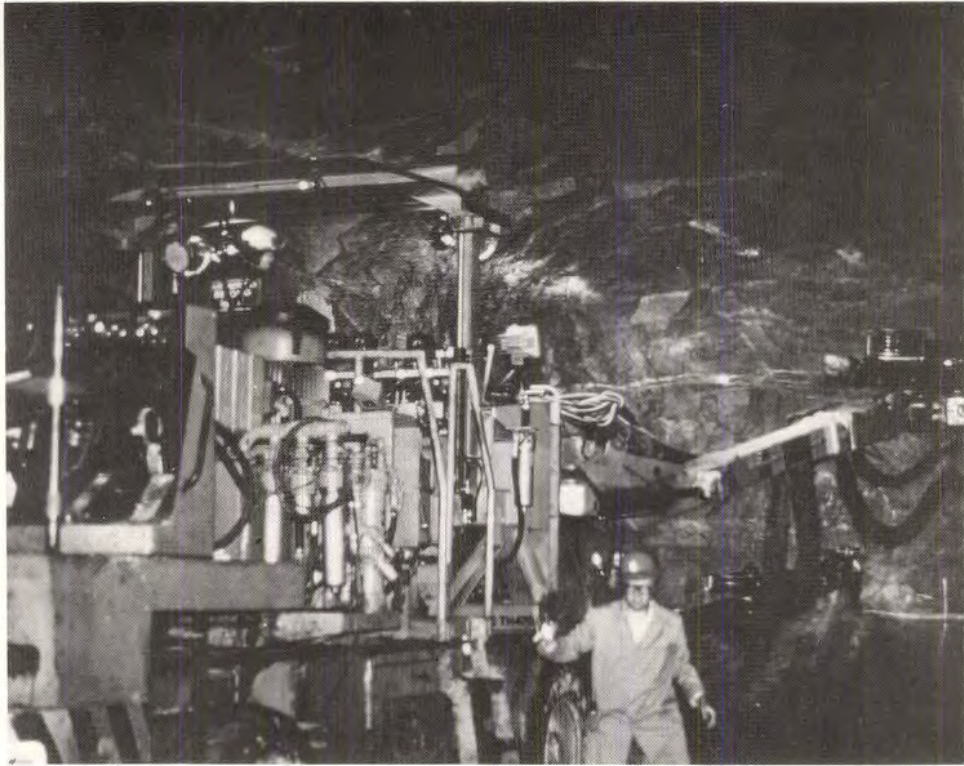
Truck mounted hydraulic powered drill jumbo
